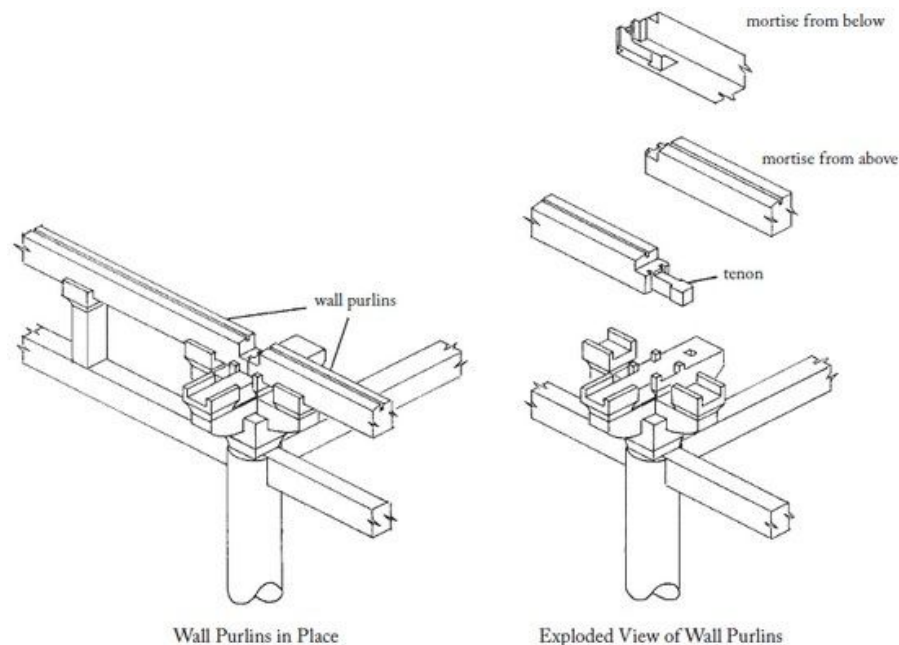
Wall purlins are spliced over the column and bracket sets with a variant of the “gooseneck” joint, leaving a recess and smooth surface on top to receive members above.
